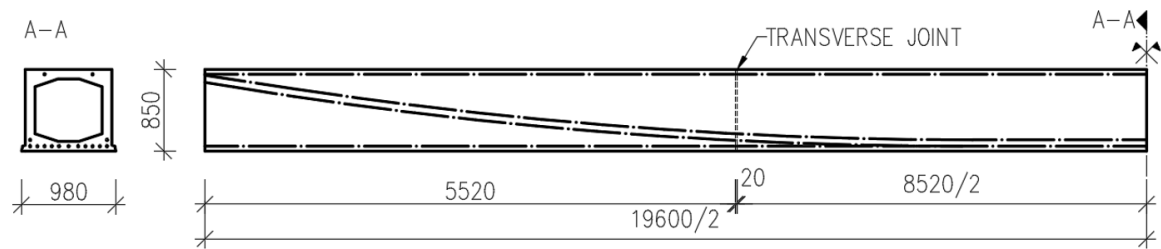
Cross-section at mid-span and longitudinal section of half of beam KA 61/18 with prestressing tendons [1].
